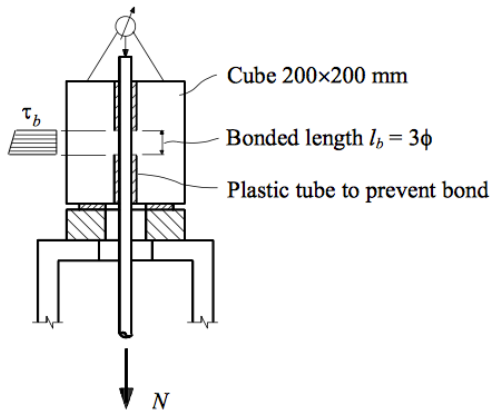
Illustration of pull-out test (Engström, *Restraint cracking of reinforced concrete structures*, 2014).
